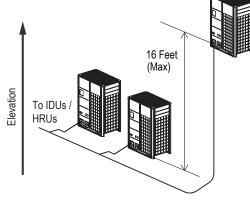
Maximum Pipe Length from First Outdoor Unit Y-branch to Farthest Outdoor
